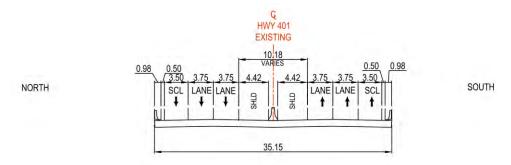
Typical Section - Highway 401 at County Road 41 Overpass
